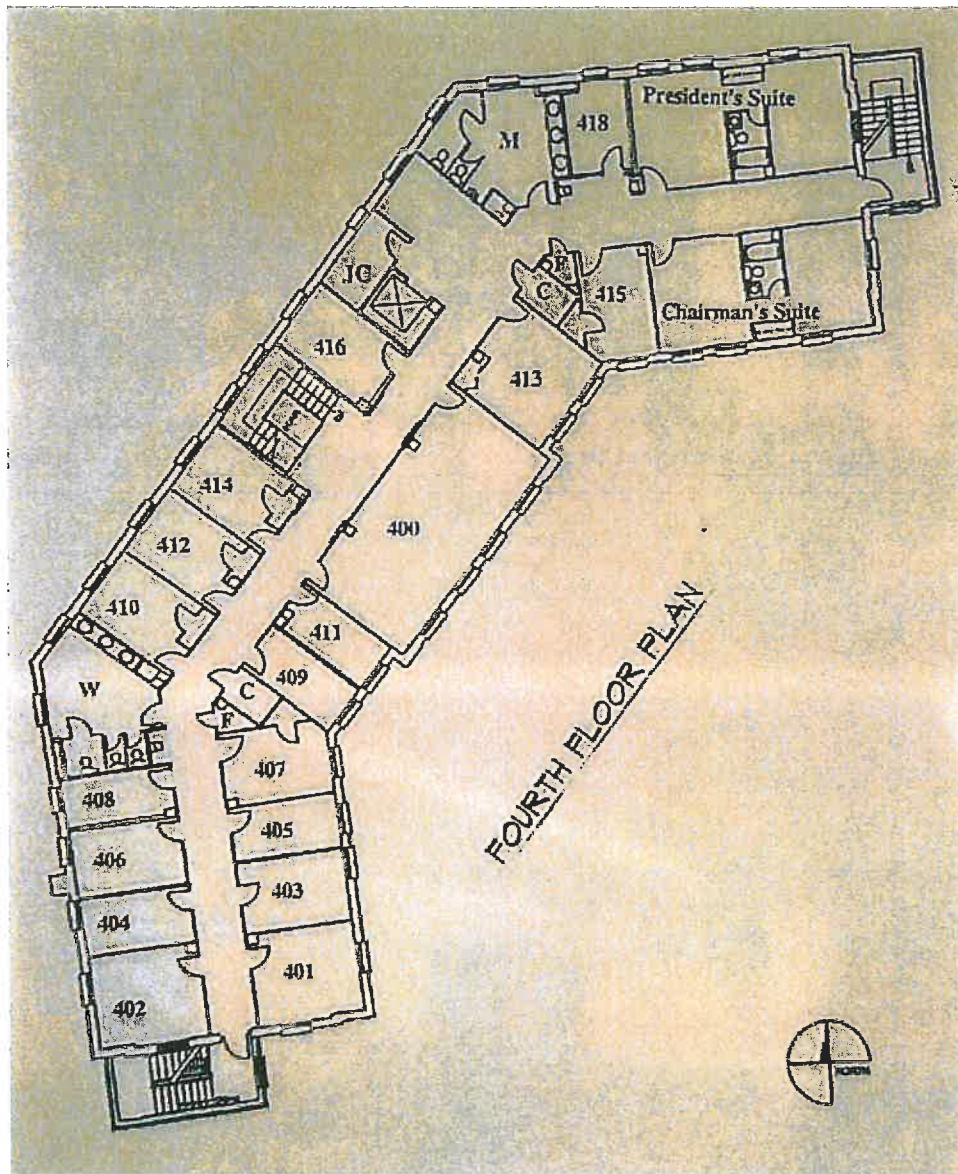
Current fourth floor plan (second and third similar). Plan from KCU Archives.
